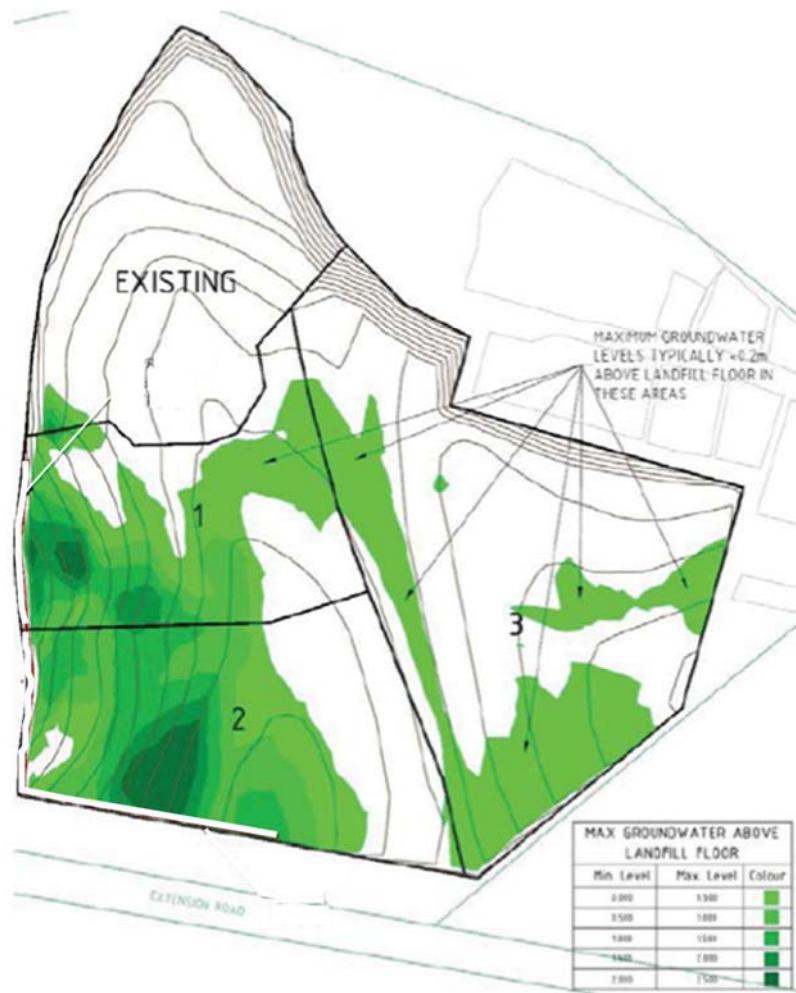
Elevation of Maximum Groundwater Heads above landfill floor for Amended Proposal Site (no mitigation)
